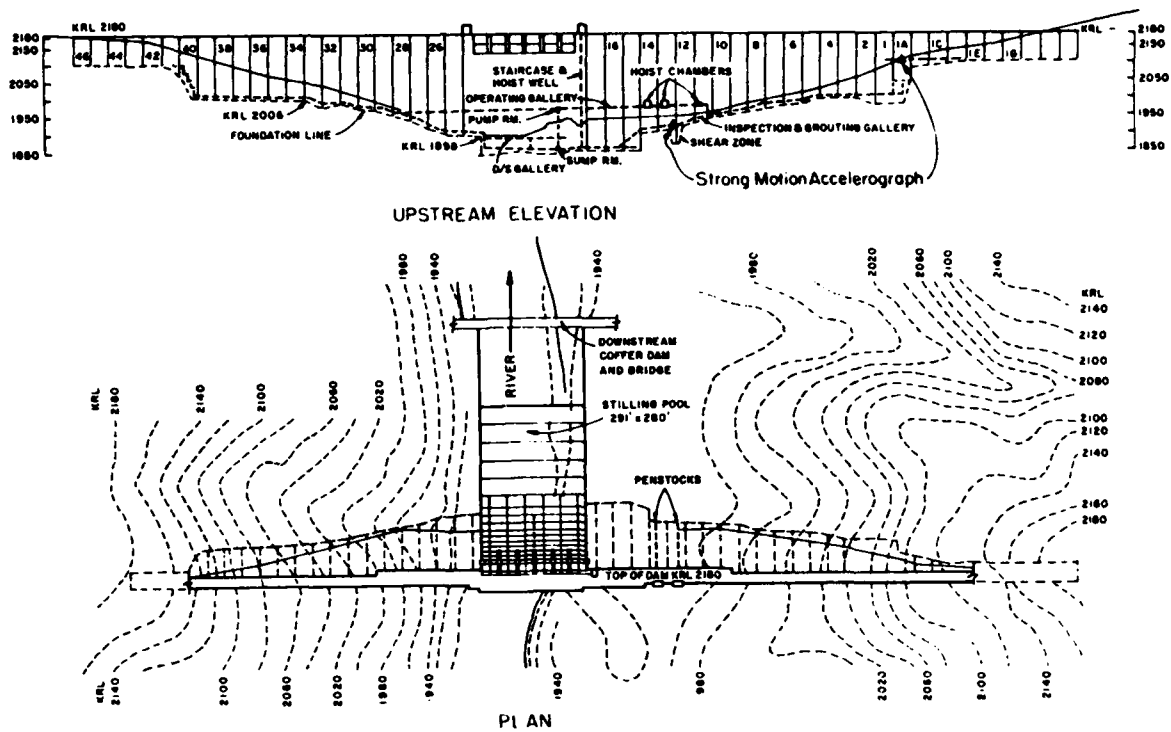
Koyana Dam prototype, plan and elevation. From [3]
